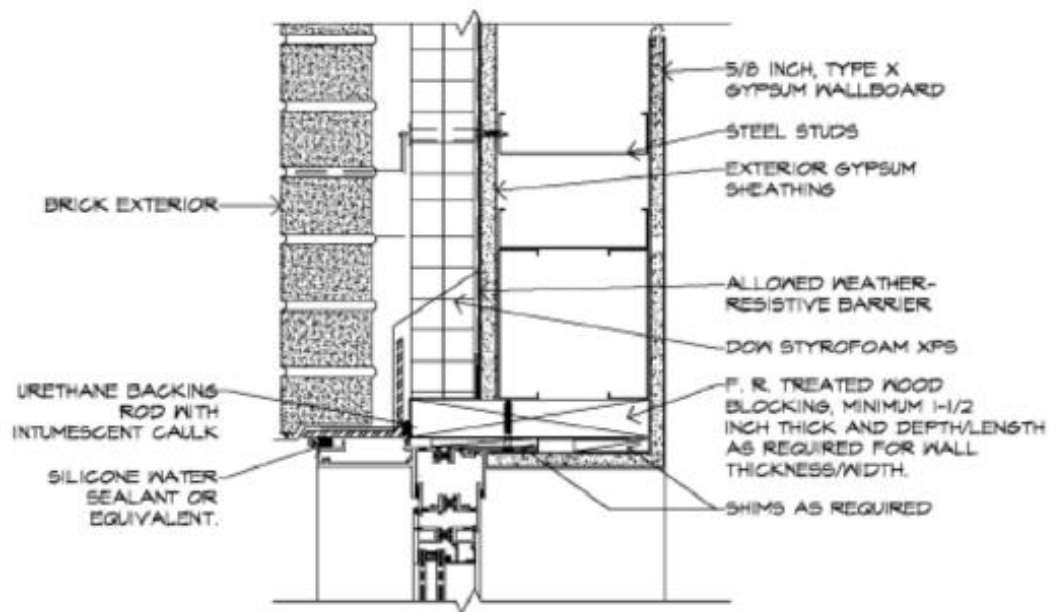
WINDOW HEAD DETAIL—FRTW WOOD BLOCKING—FRAMED WALL
